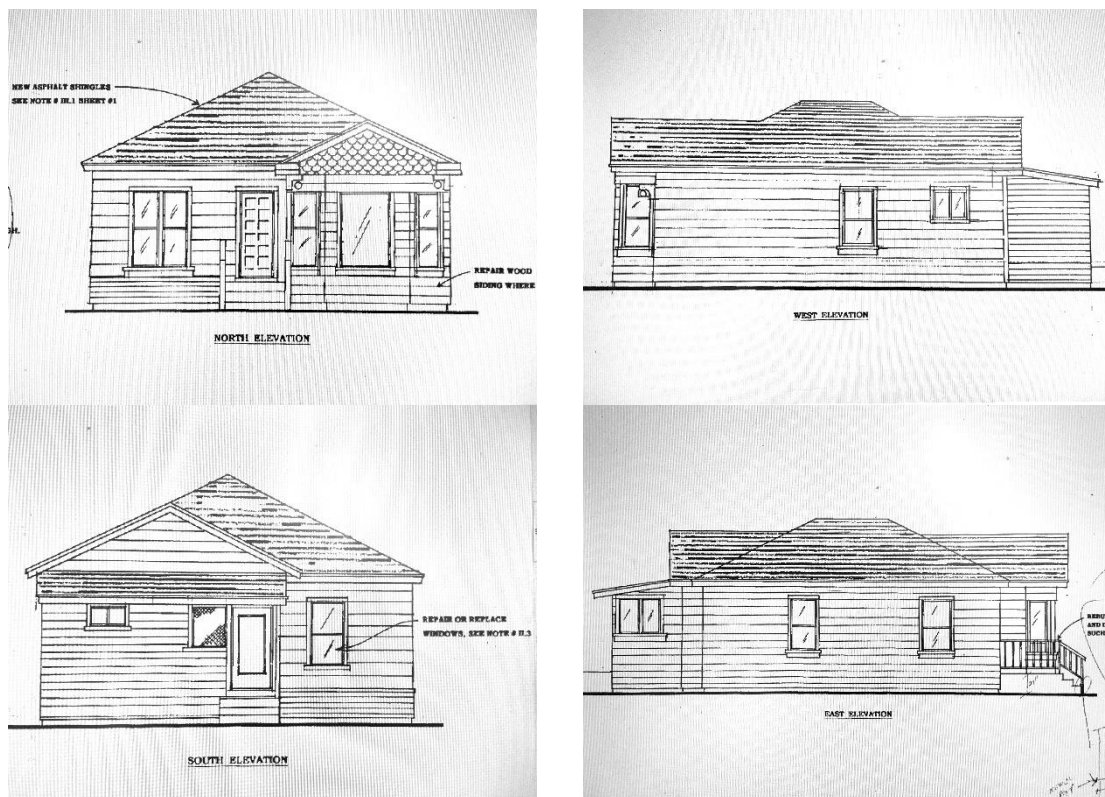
1994 elevation drawings for proposed improvements to 488 East St. John Street, by Guerra & Associates.
